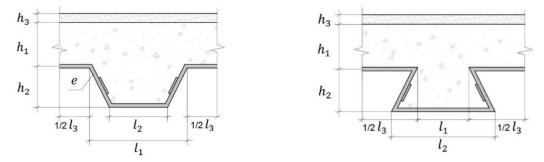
Composite slab with profiled sheeting: trapezoidal and re-entrant sheeting.
